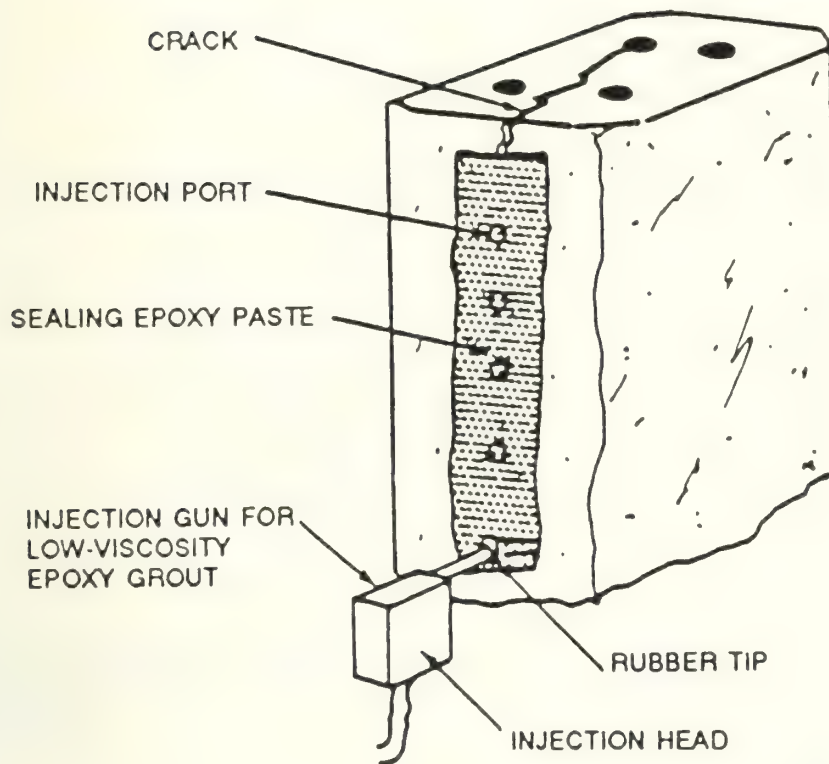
Typical Arrangement for Concrete Crack Repair Using
